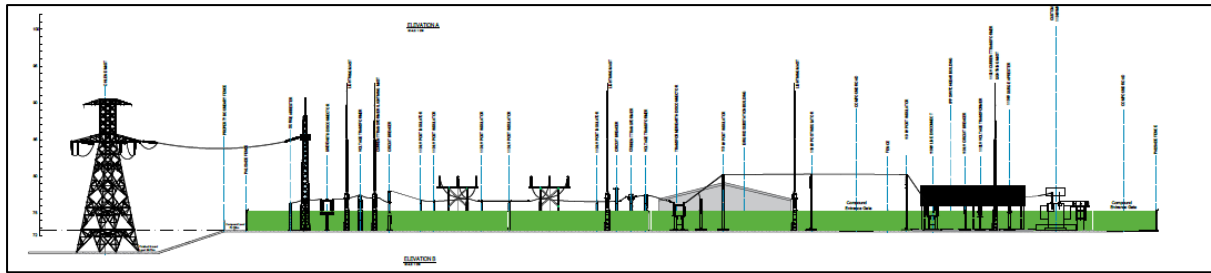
Extract of Compound Elevation B of the proposed development, looking in a north-western direction (Source MWP Drawing No. 23991-MW- 00-ZZ-DR-C-5403)
